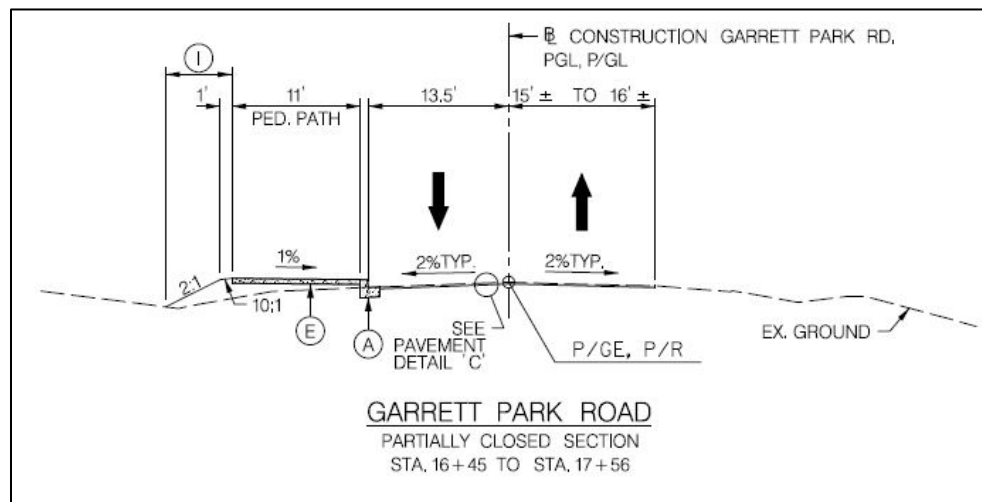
Proposed Typical Cross Section Design – Stations 16+45 to 17+56
